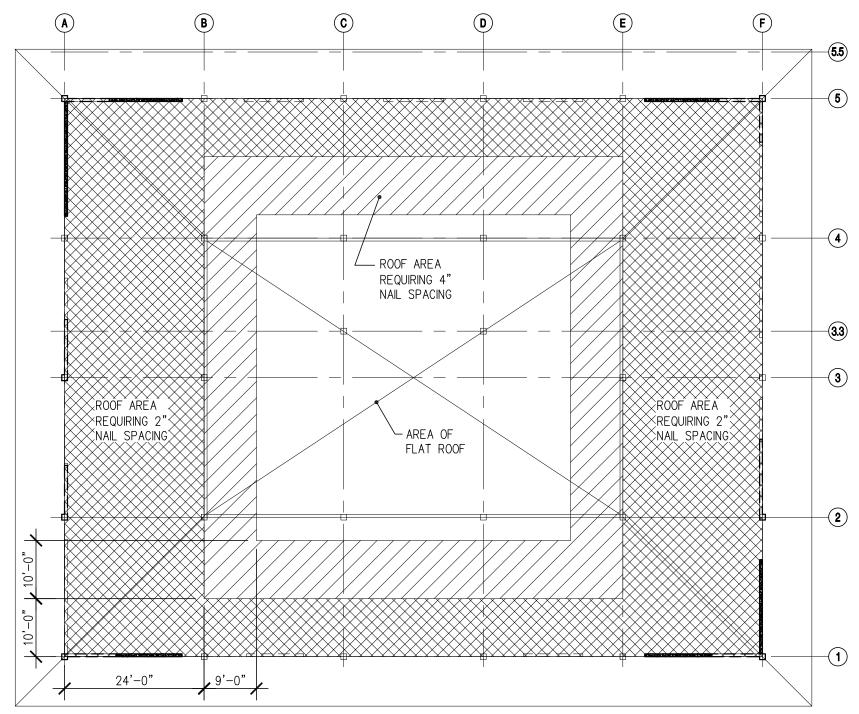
B: KEY ROOF PLAN (MAIN FLOOR WALLS SHOWN DASHED)
